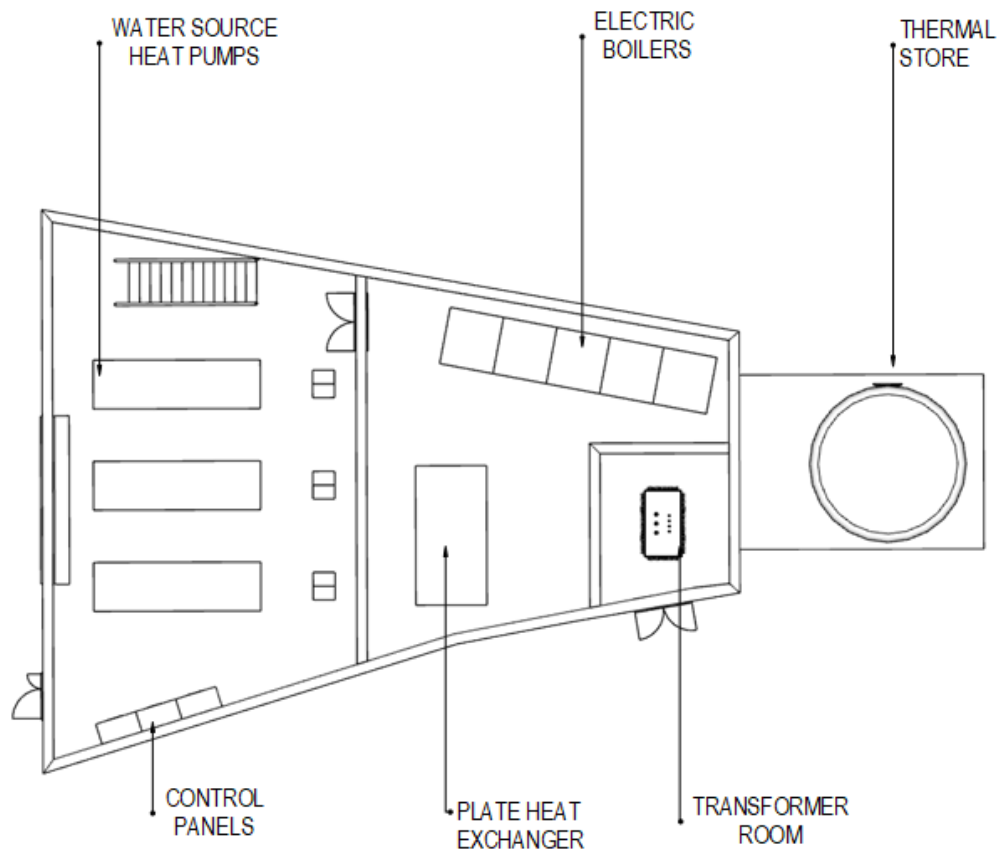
General arrangement drawing of the proposed energy centre – ground floor
